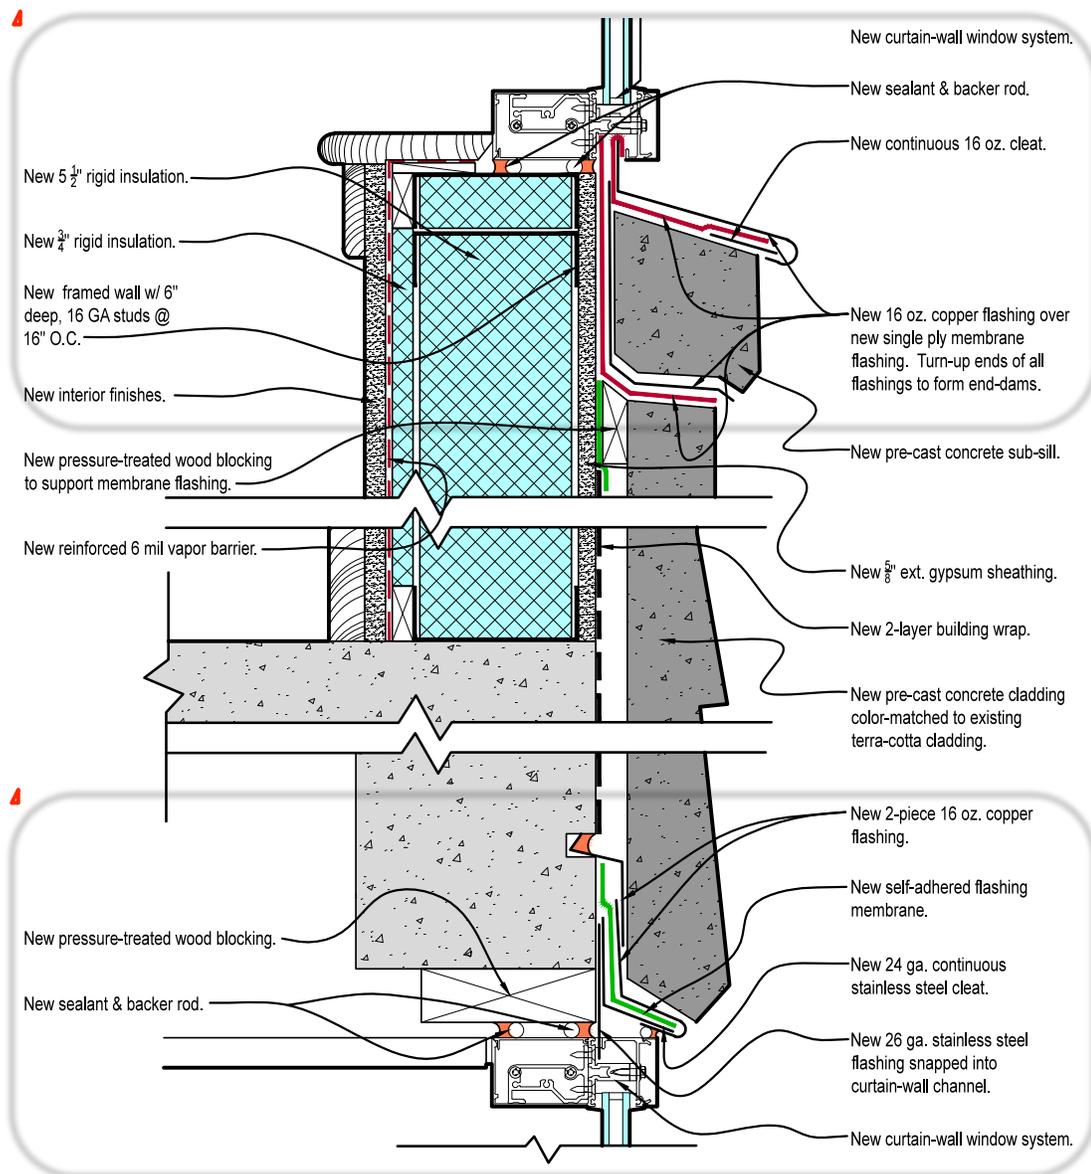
(1): Window Head & Sill Installation at Typical Cladding Panel Loc.
